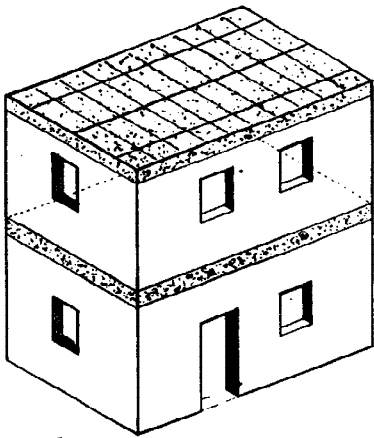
Wall-slab connections with a continuous (reinforced concrete) rib.
